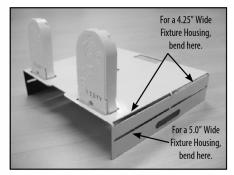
Preparing the Fixture Bracket Socket Plates for Installation.
